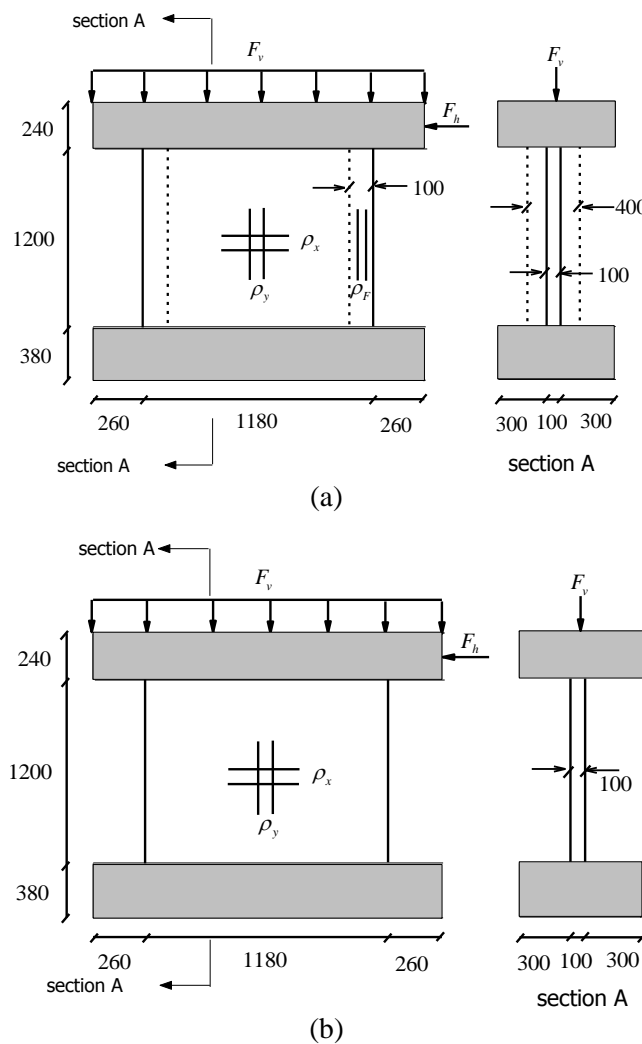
Geometry and loading configurations of the shear walls tested by Maier and Thürlimann (1985) (dimensions in mm): (a) the walls in *group A* (with vertical flange); (b) the walls in *group B* (without vertical flange).
